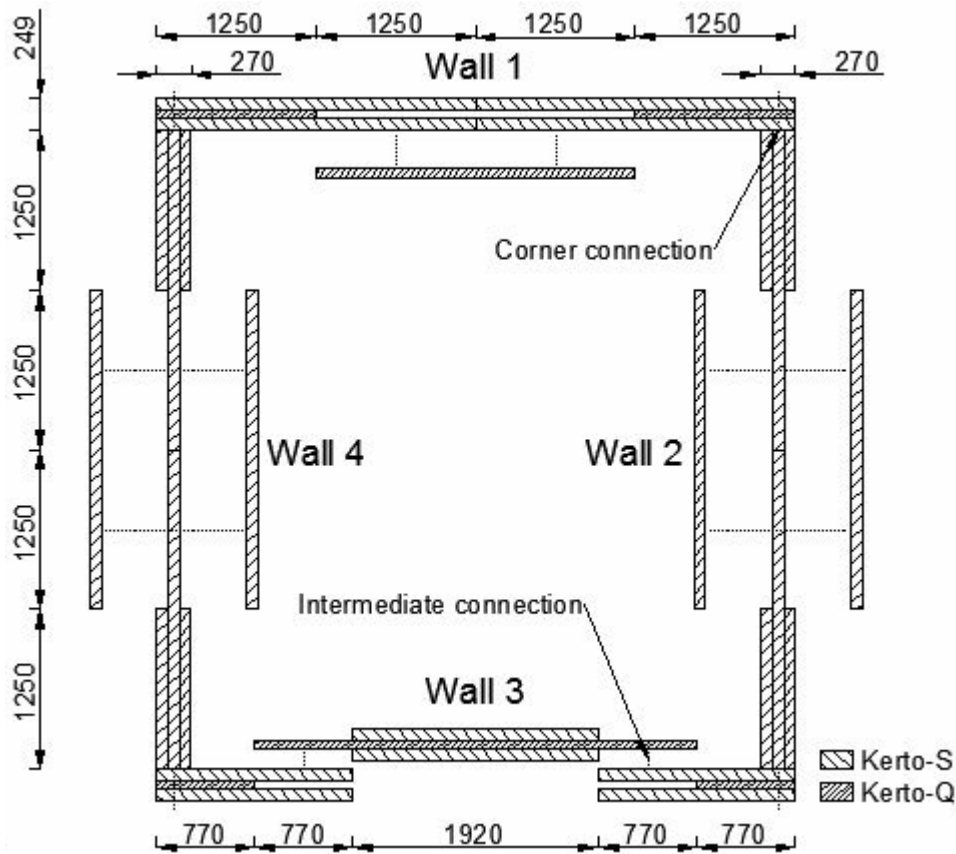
Proposed composition of the central core walls made from Kerto-S and Kerto-Q (Indicative)
